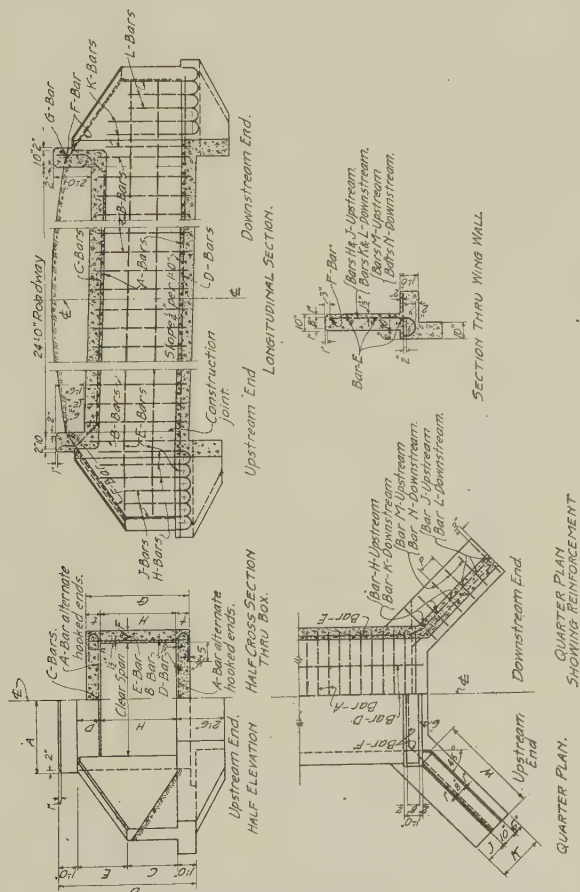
STANDARD CONCRETE BOX CULVERT AS DESIGNED BY THE STATE HIGHWAY DEPARTMENT OF MISSOURI.
